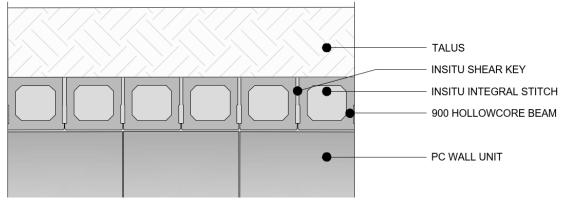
Hollowcore beams (roof) buried under talus fill
